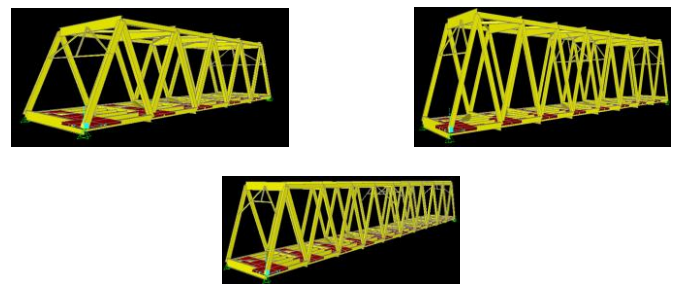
Elevation of 40m, 60m and 80m span without TMD
